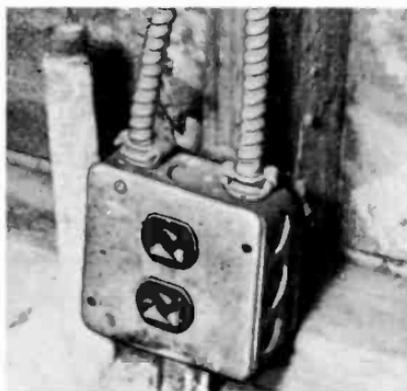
In-house wiring to underground cable to provide switching of lights from house to garage, plus separate power for outlets in garage.
